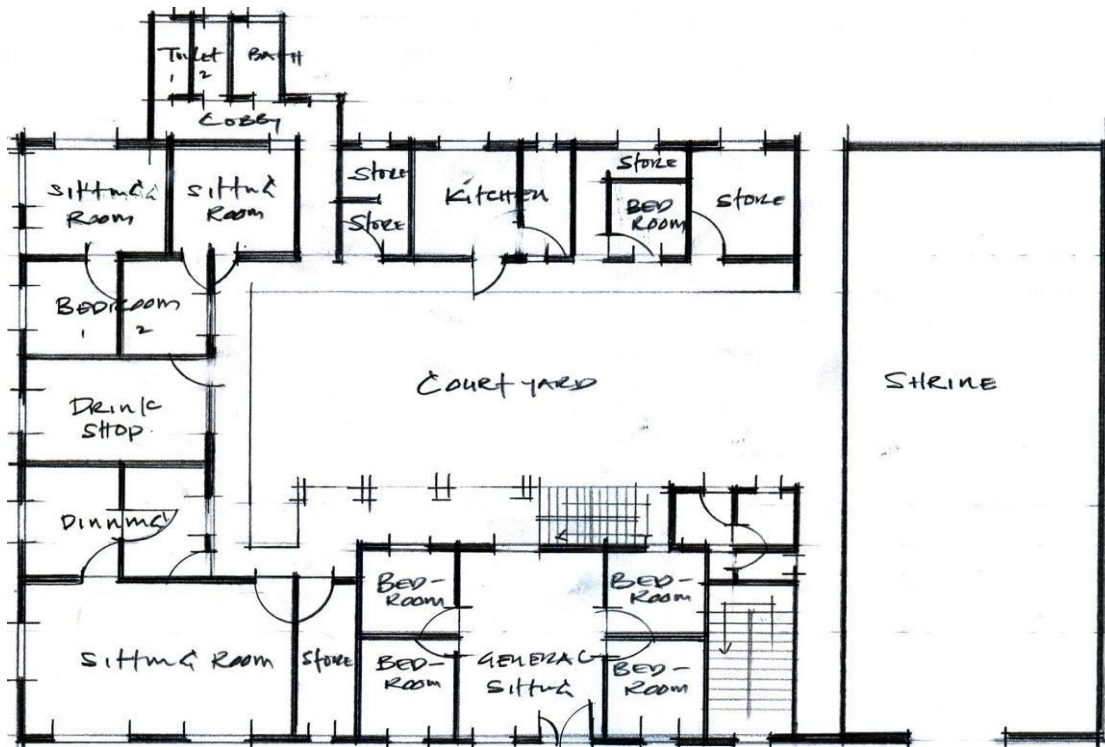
Floor Plan of a Typical Palace-Compound Benin House
